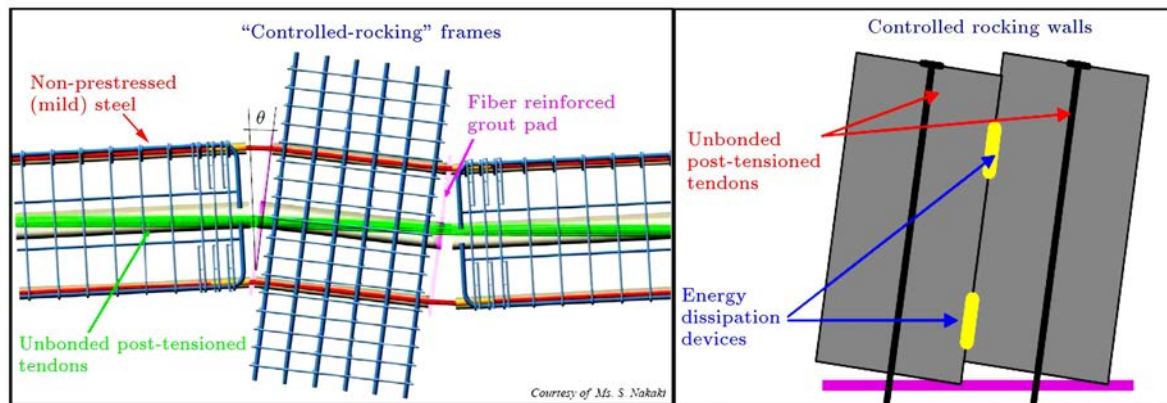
Jointed precast systems: (a) Hybrid frame; and (b) hybrid wall [58].
